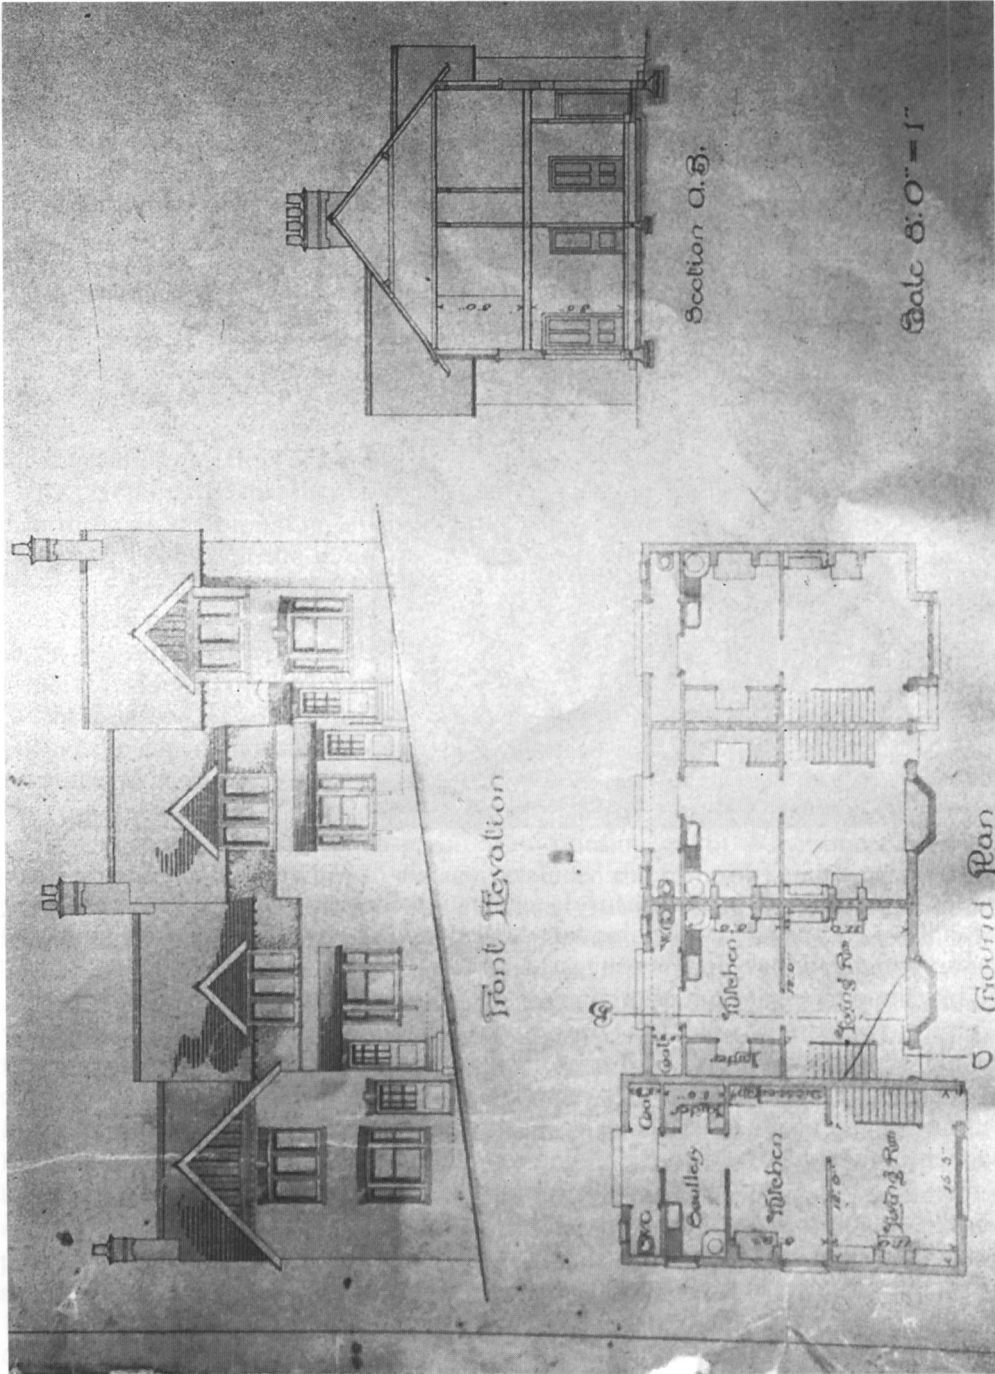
Sevenoaks: ground plan, section & elevation, f 29-32 Holyoake Terrace (c. 1906) (Photo by Roz Archer)
